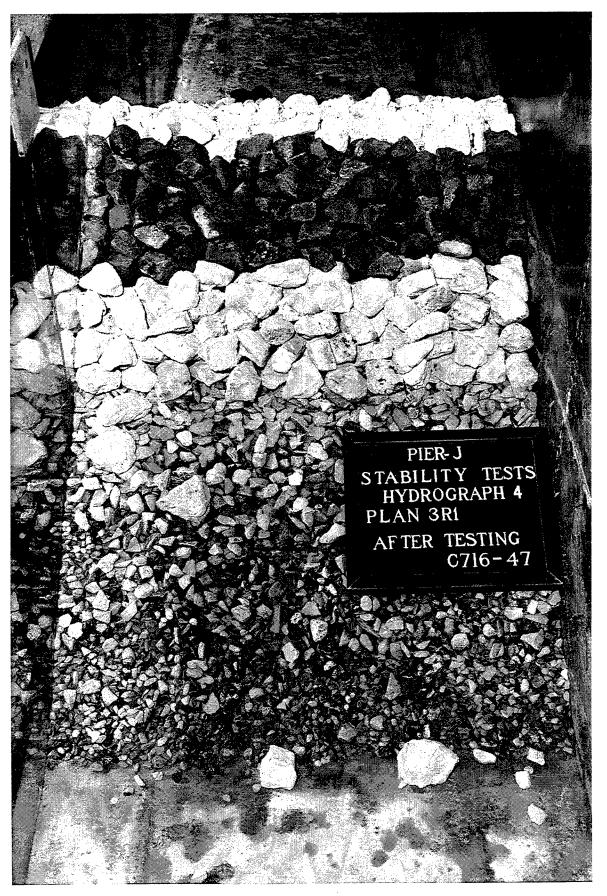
Harbor-side view of Plan 3R1 at the conclusion of testing
